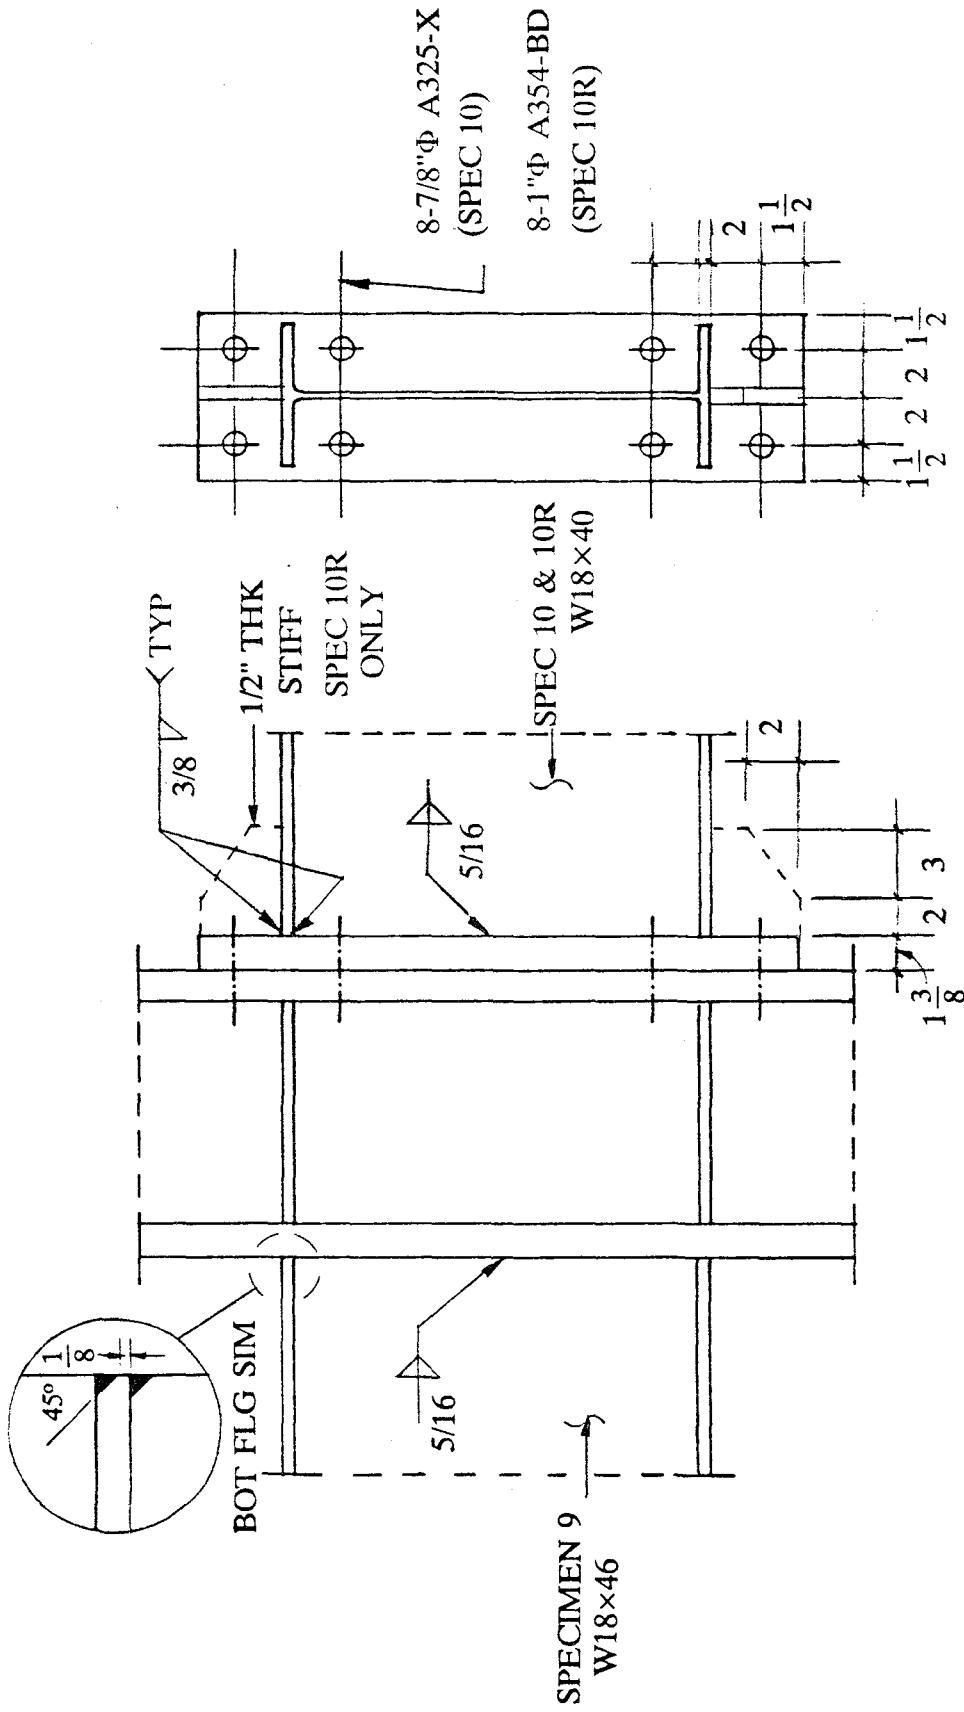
Connection Details: Specimens 9, 10 and 10R
